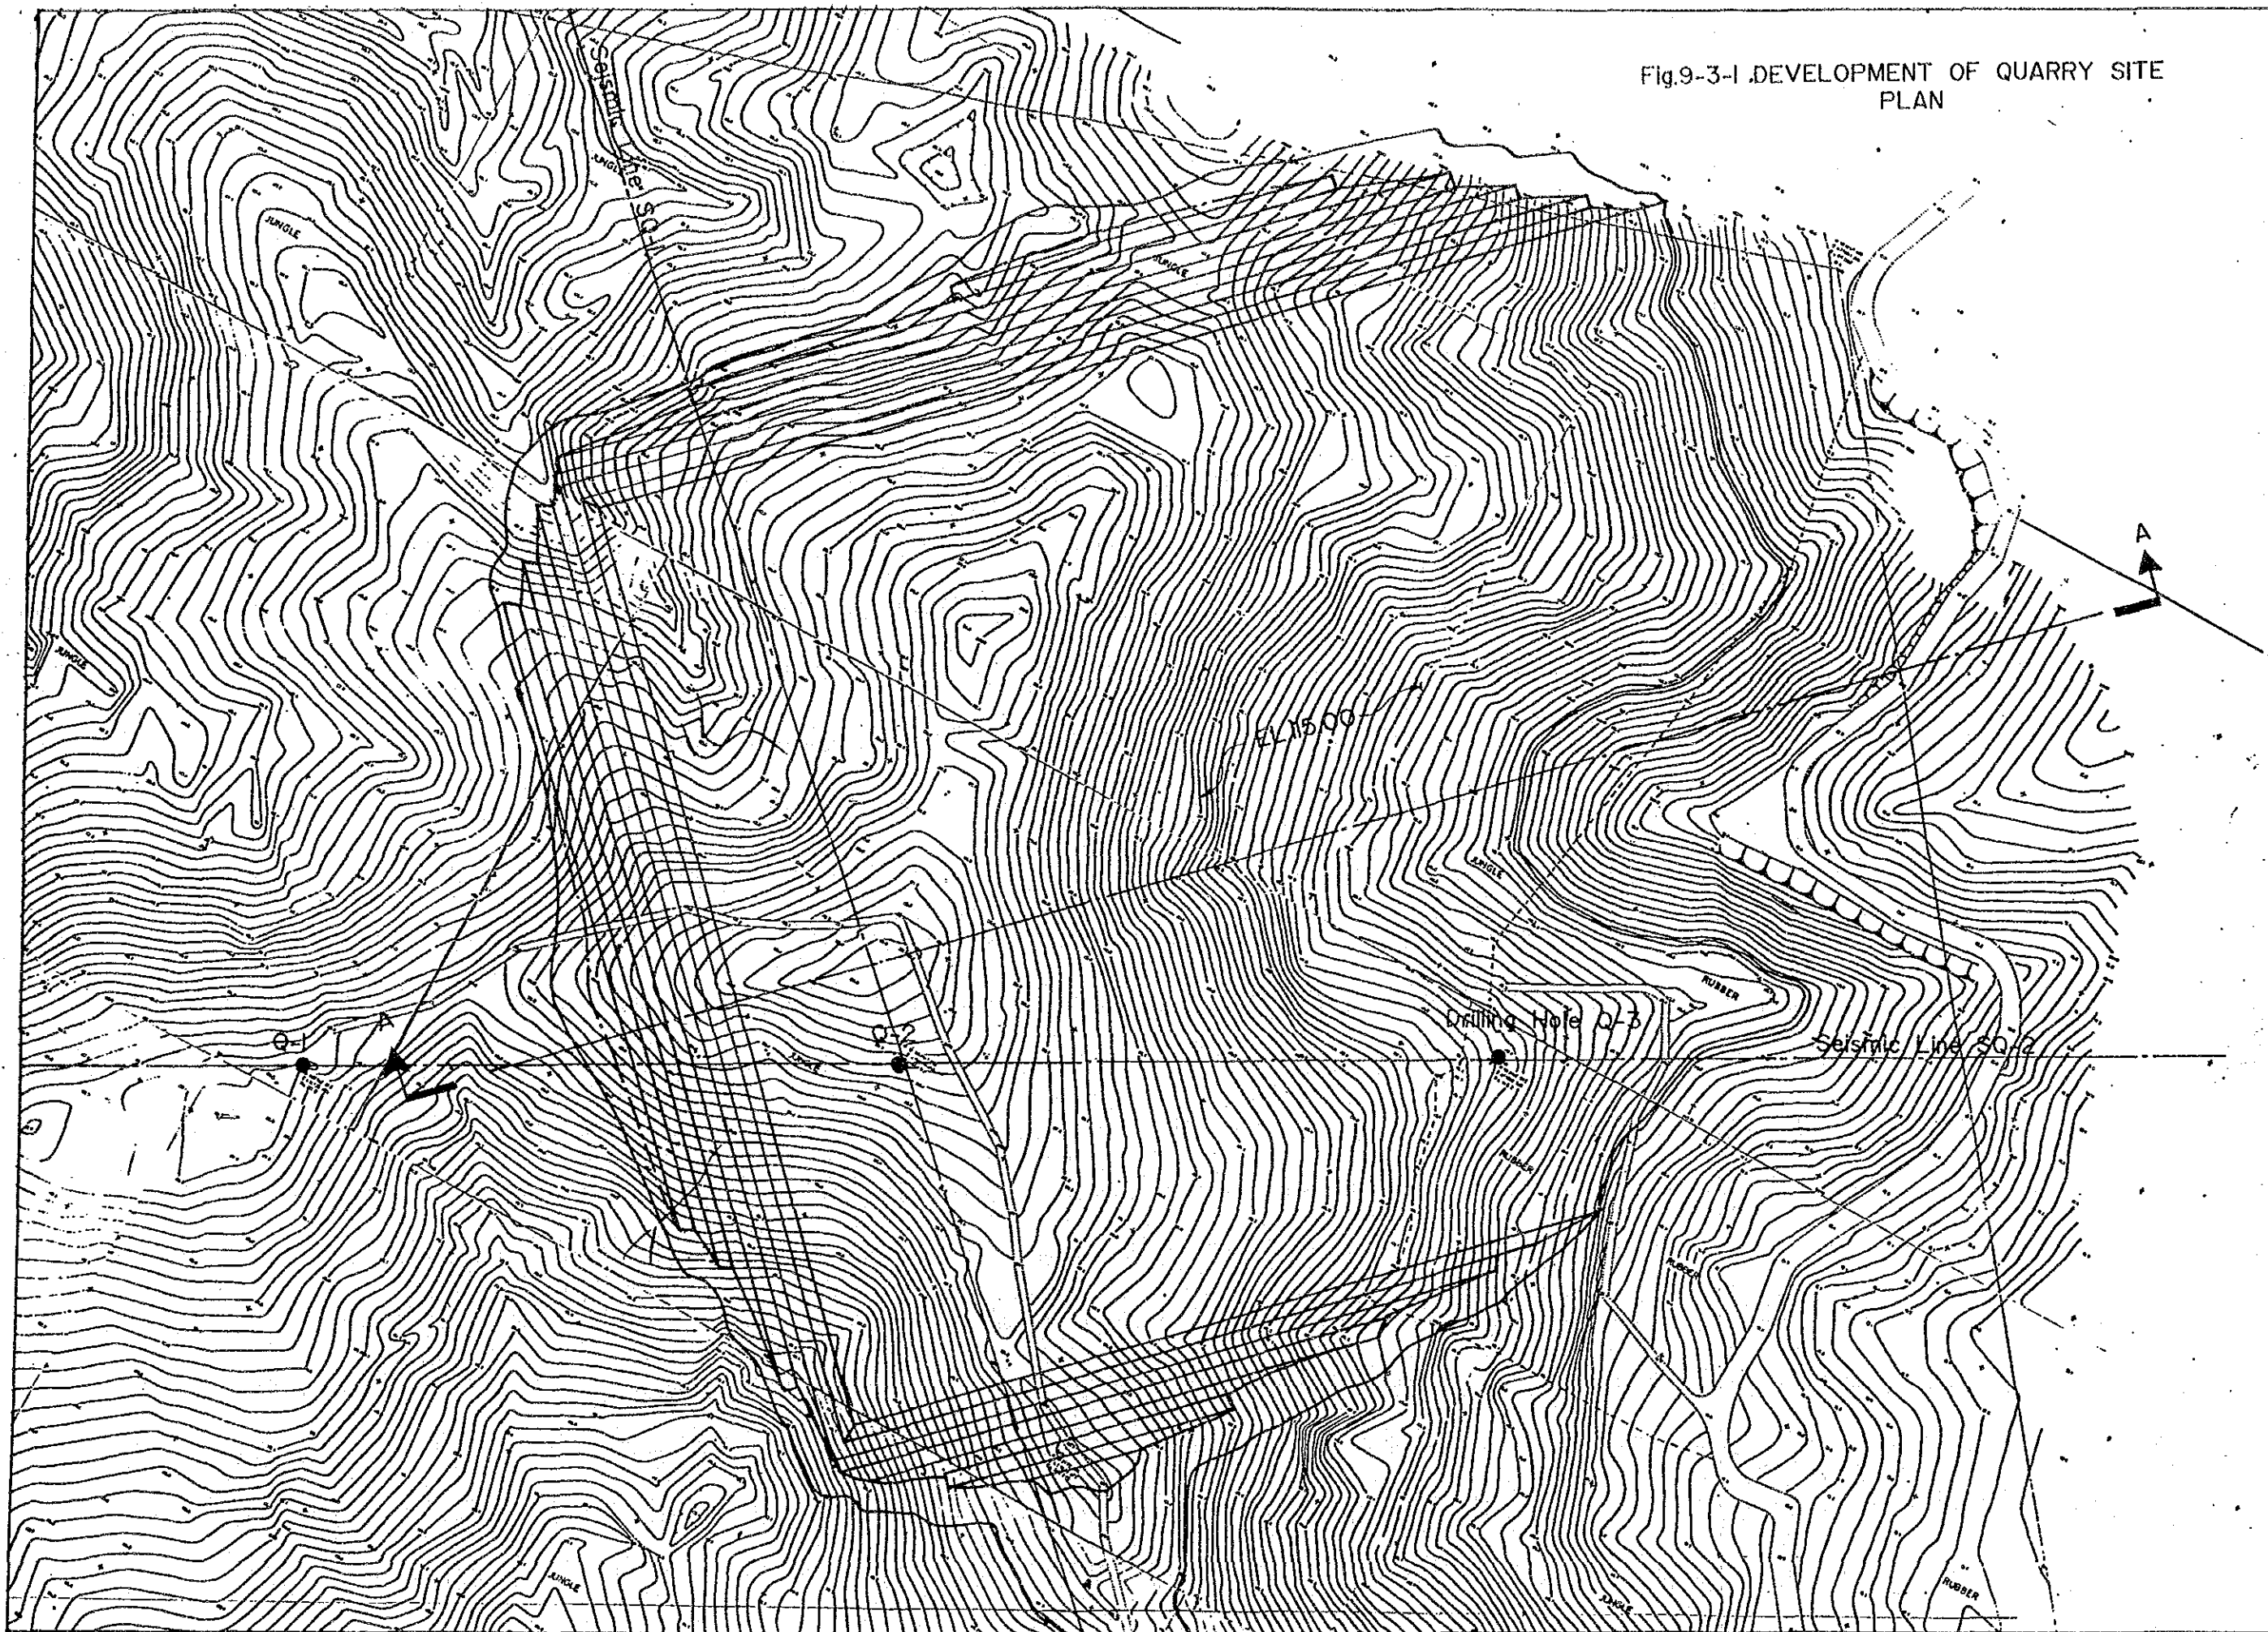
DEVELOPMENT OF QUARRY SITE PLAN
